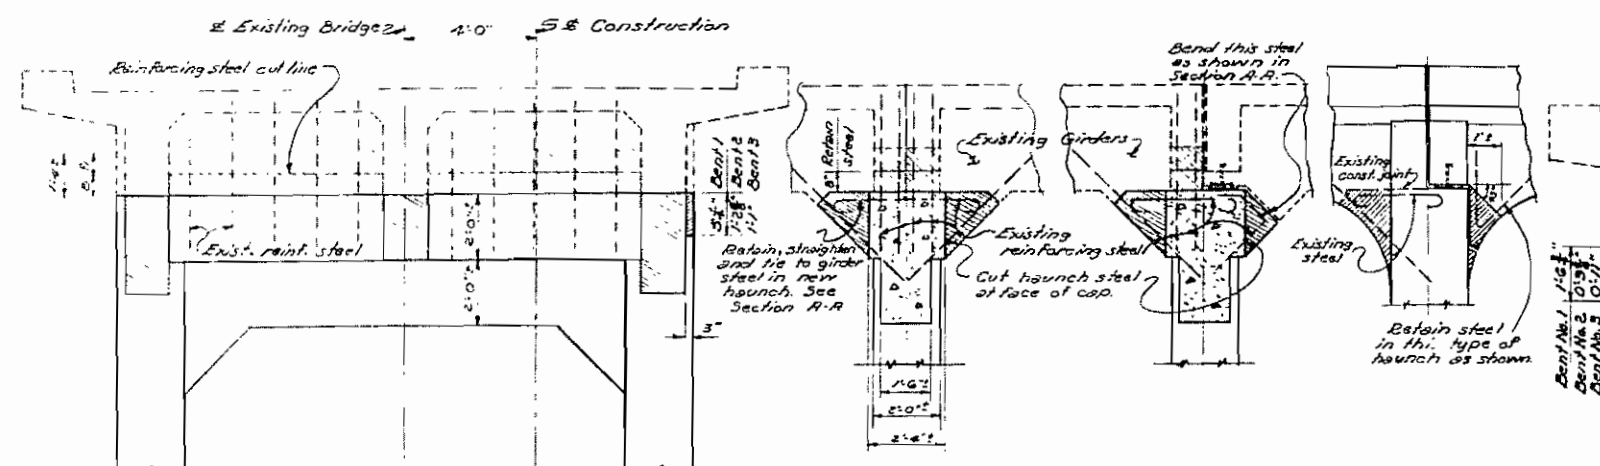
DETAILS OF REMODELING ABUTMENTS NO. 1 & 2
